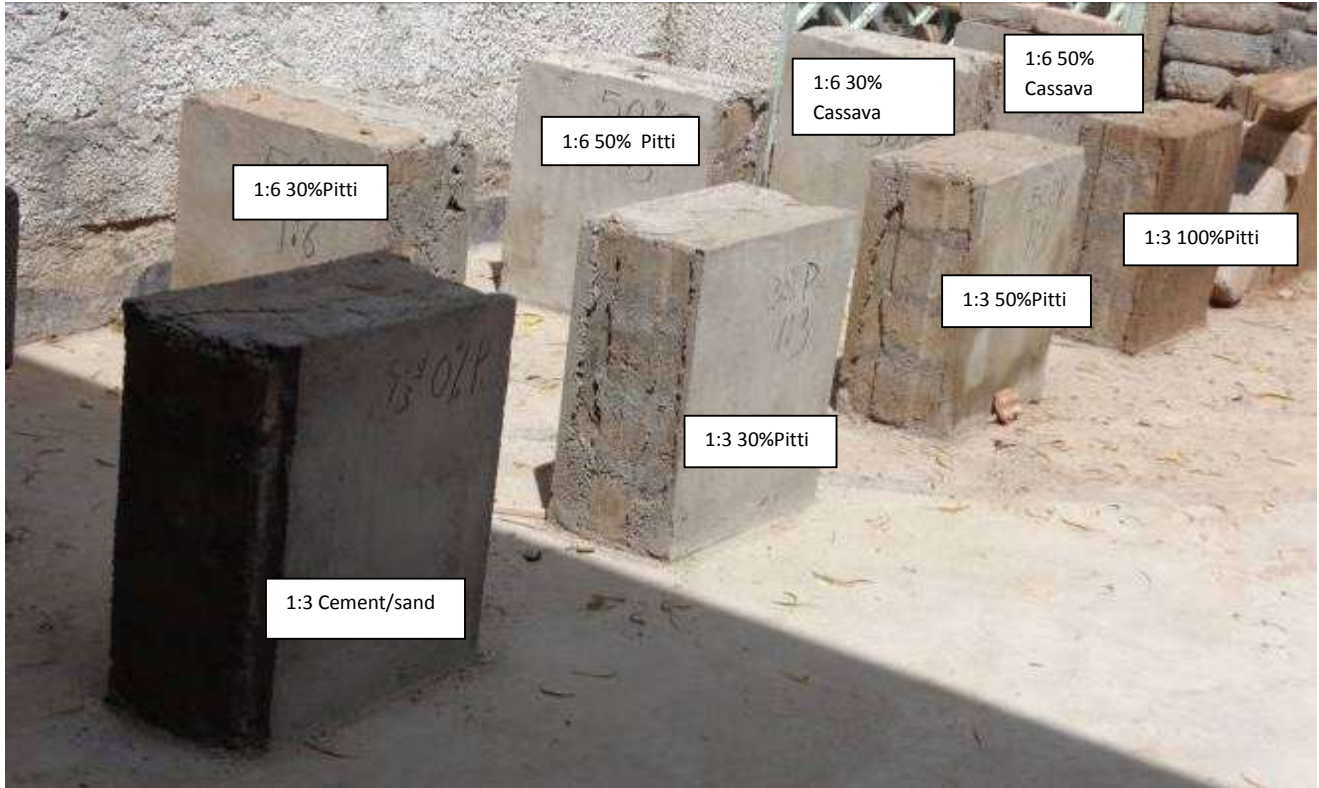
The photos of the walls that was constructed for bonding/durability test
